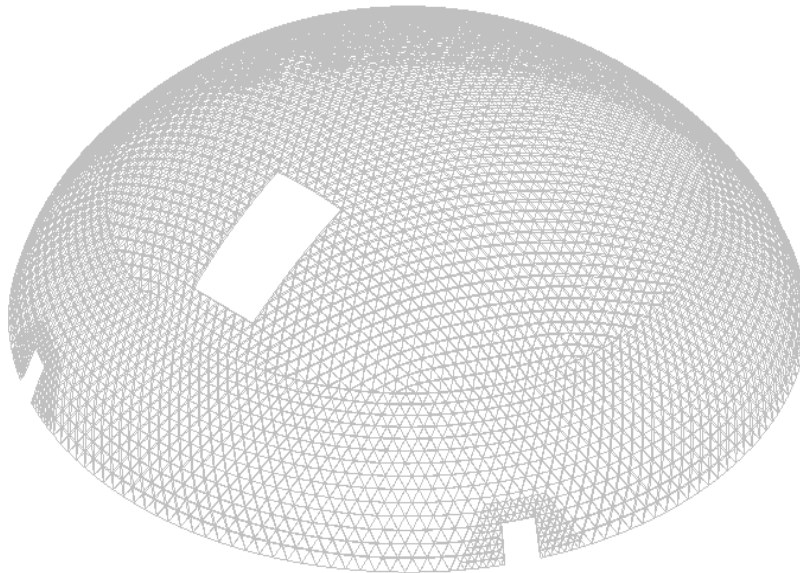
Dome with opening size 16.45 m x 10.74 m
